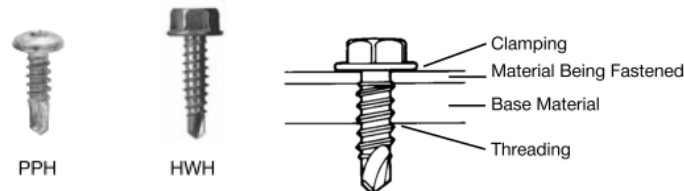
Type of Screw, Philip pan head, PPH and hex washer head, HWH. (www.hilti.com.ca)
